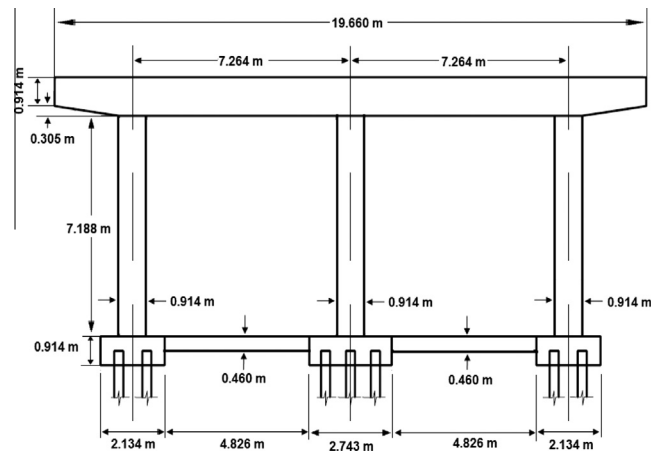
South Temple Bridge bent dimensions (adapted from [6]).
